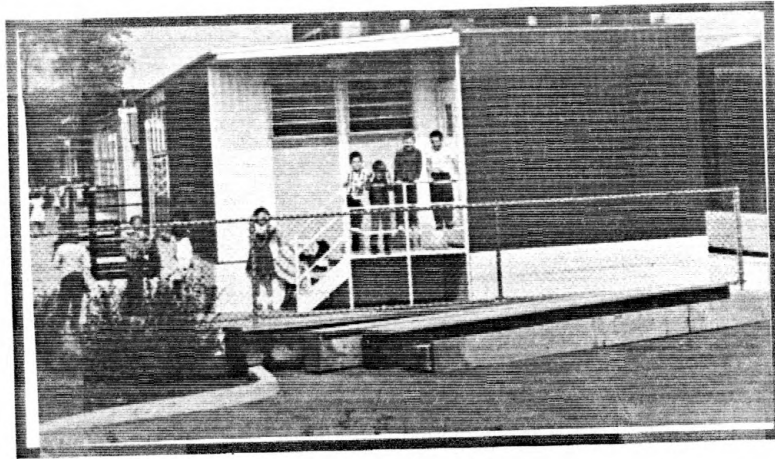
Staggered building sections allows for recessed steps and covered entry.
